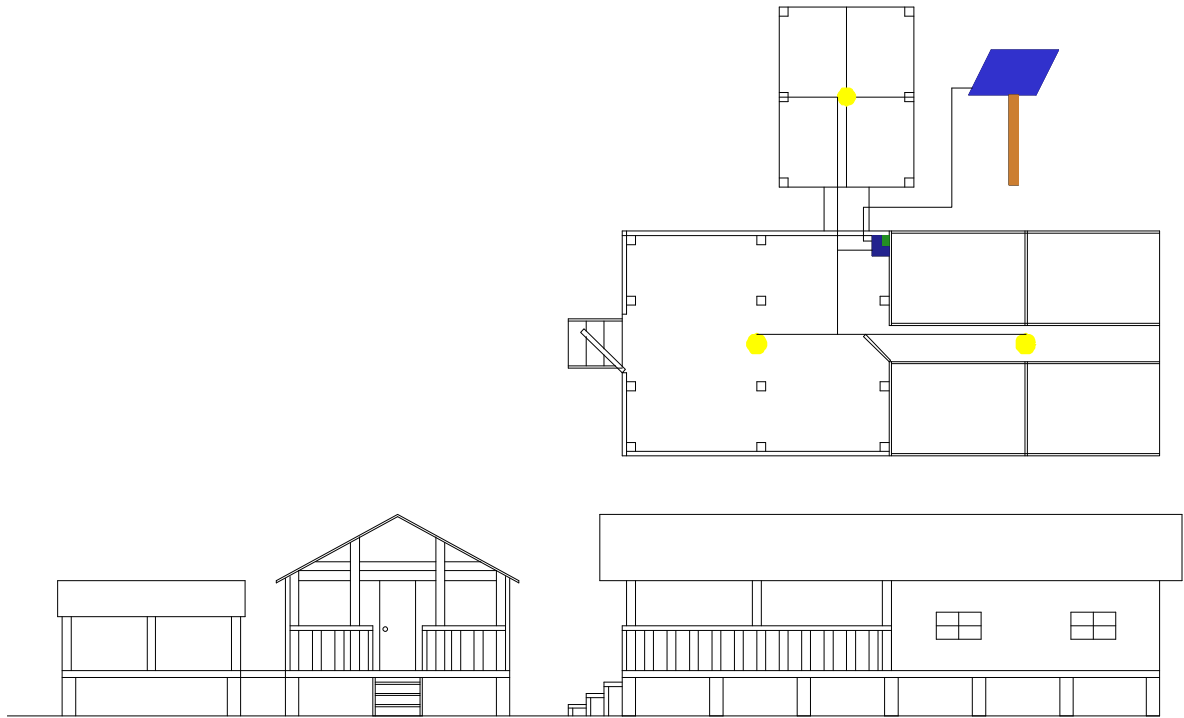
Example of Household and Wiring (Tarapoto)
